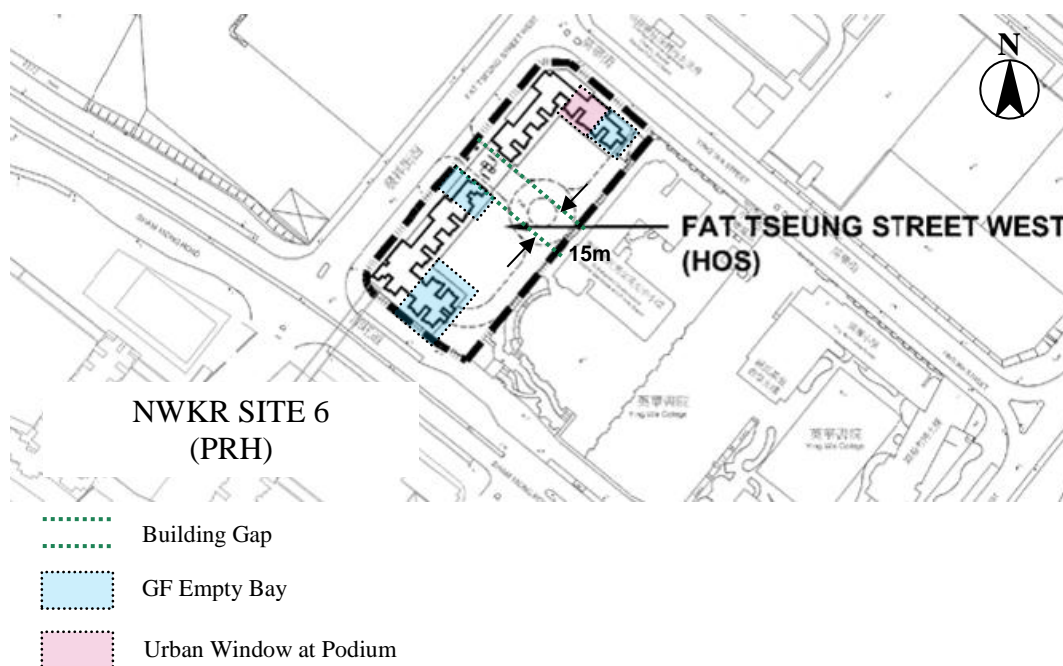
Master layout plan of Indicative Scheme for FTSW Site
